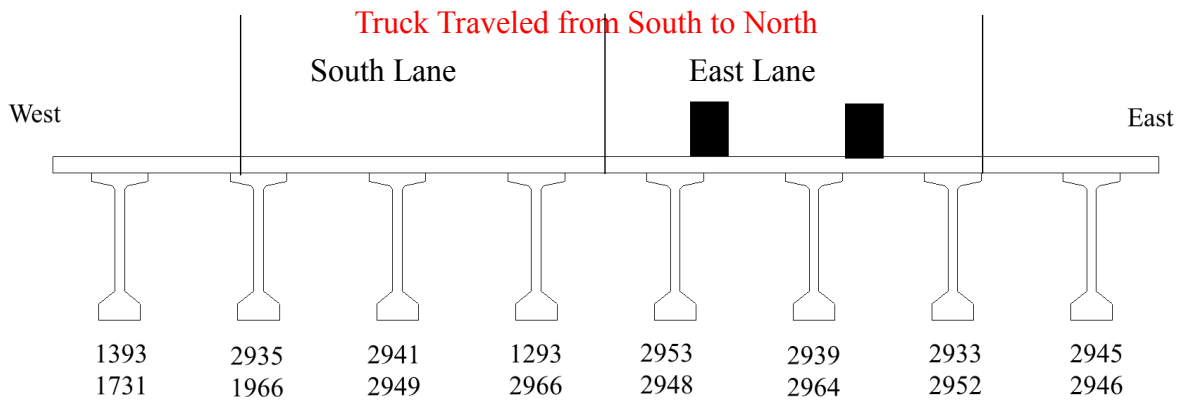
Configurations of trucks on short-span concrete girder Bridge 40320
